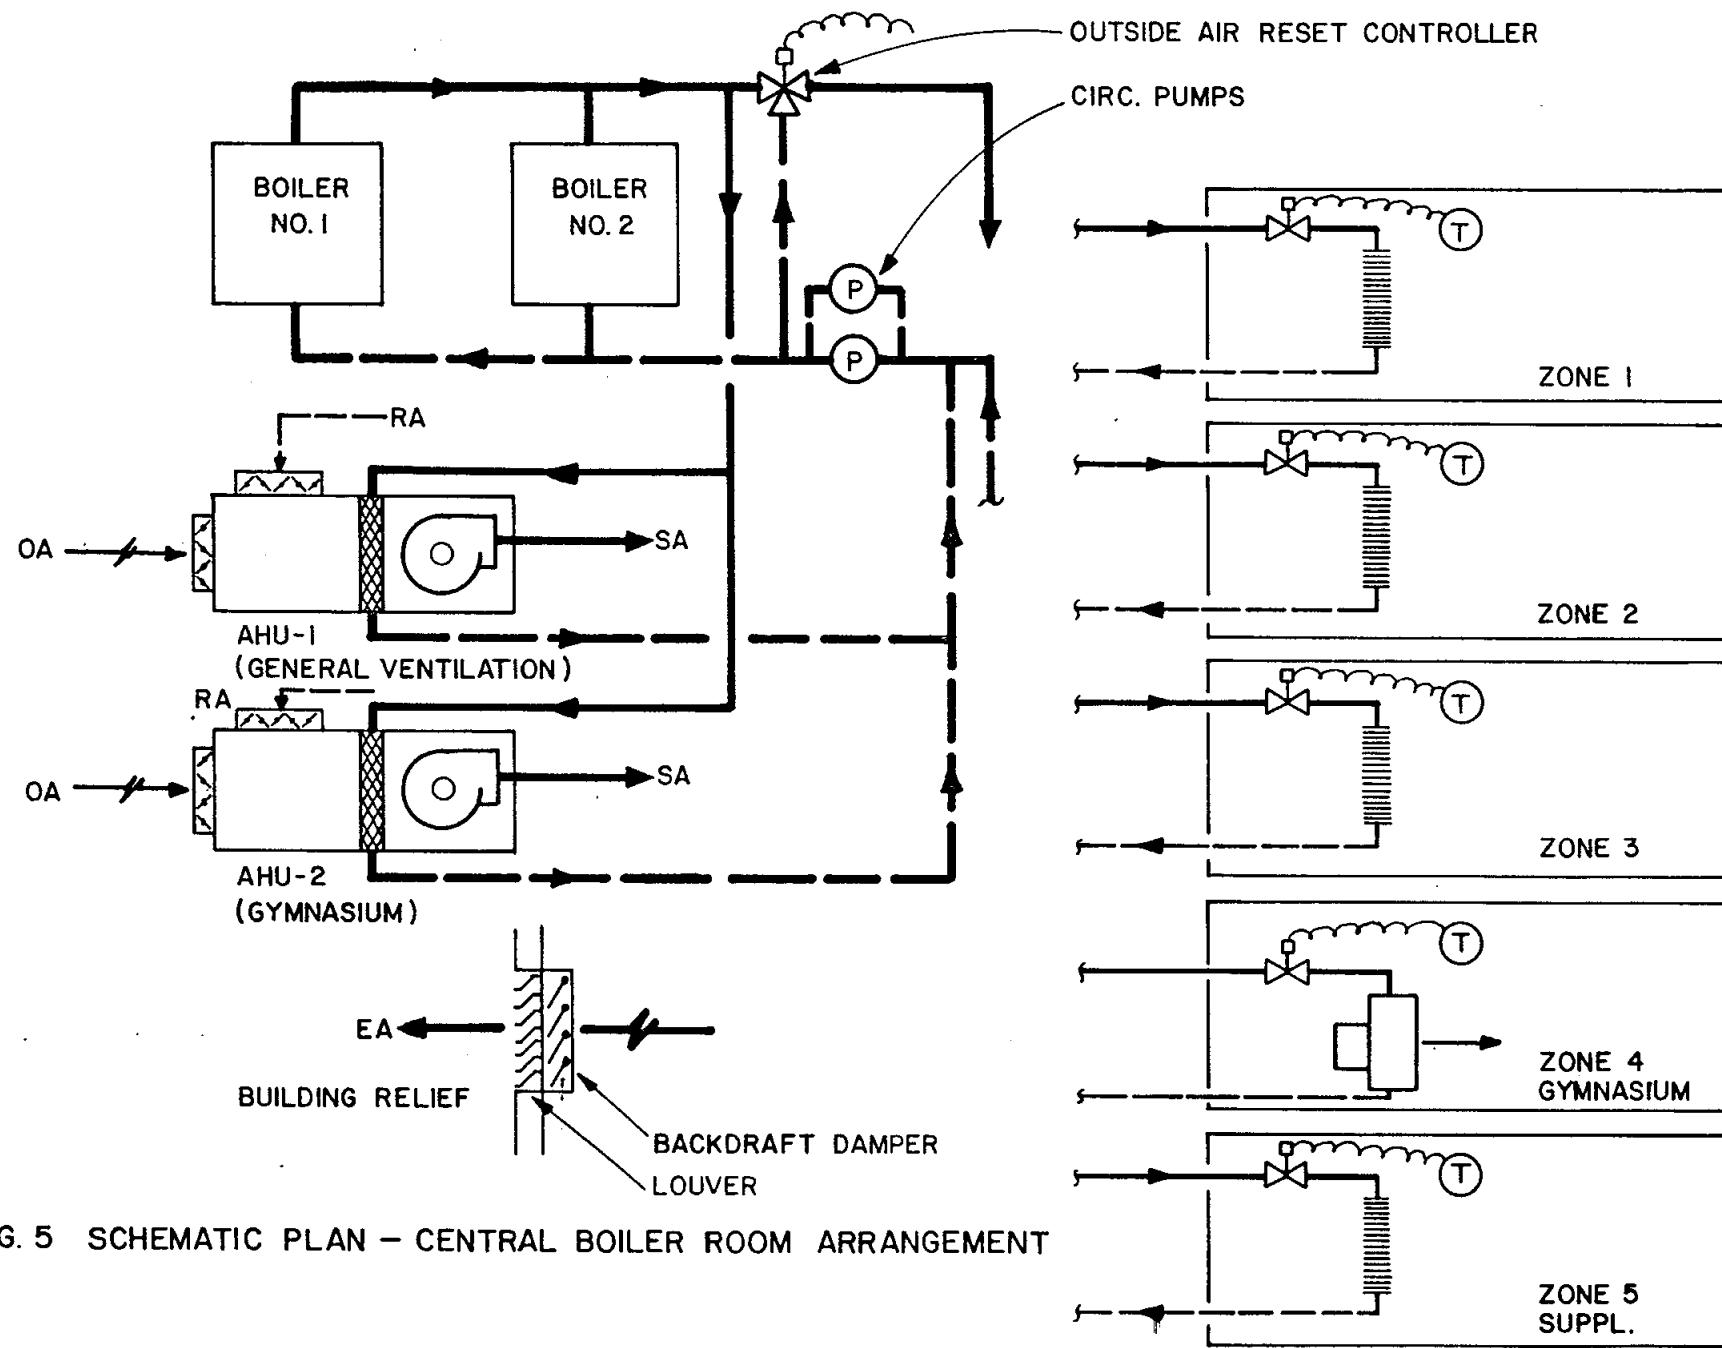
SCHEMATIC PLAN - CENTRAL BOILER ROOM ARRANGEMENT
